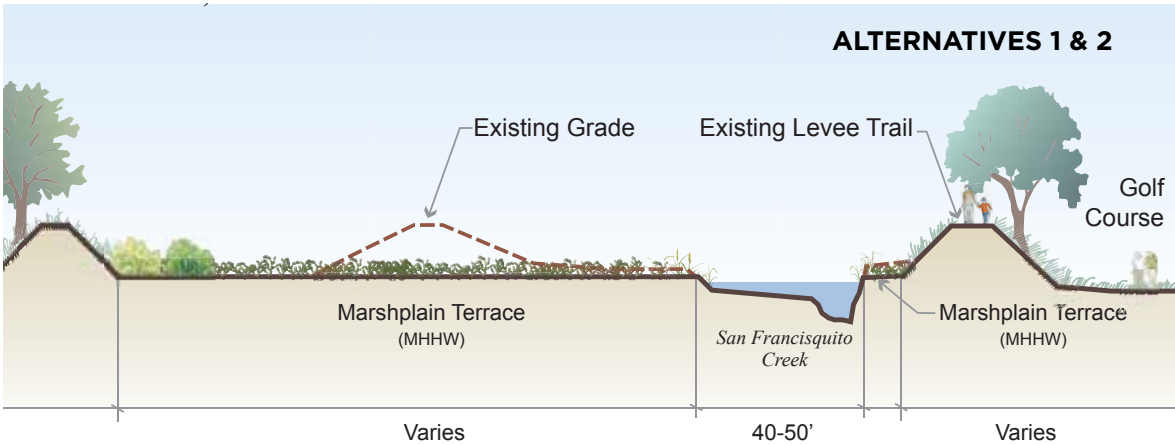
| CROSS SECTION D, VIEW LOOKING DOWNTREAM
